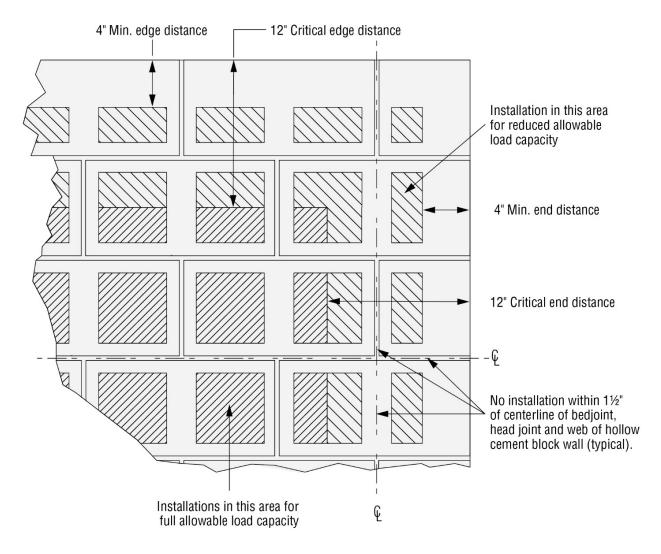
ALLOWABLE ANCHOR LOCATIONS FOR FULL AND REDUCED LOAD CAPACITY WHEN INSTALLATION IS IN THE FACE OF HOLLOW CMU MASONRY WALL CONSTRUCTION
